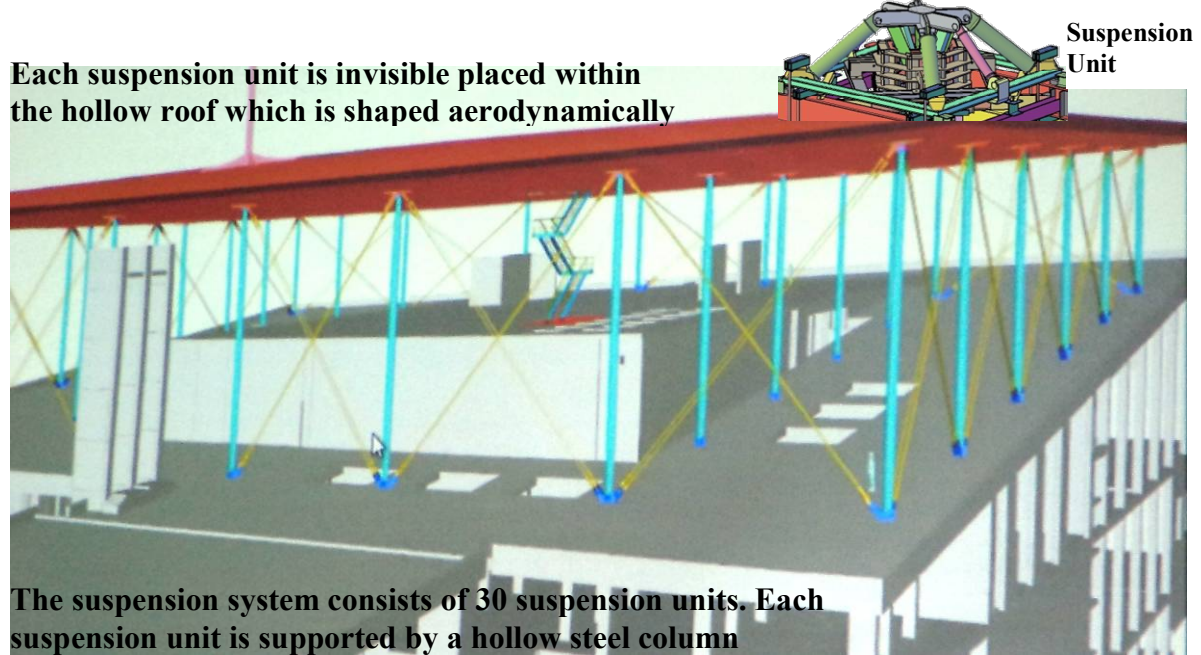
A sketch of the hollow suspended roof with the suspension units that are hosted within the spaces of the hollow roof.
